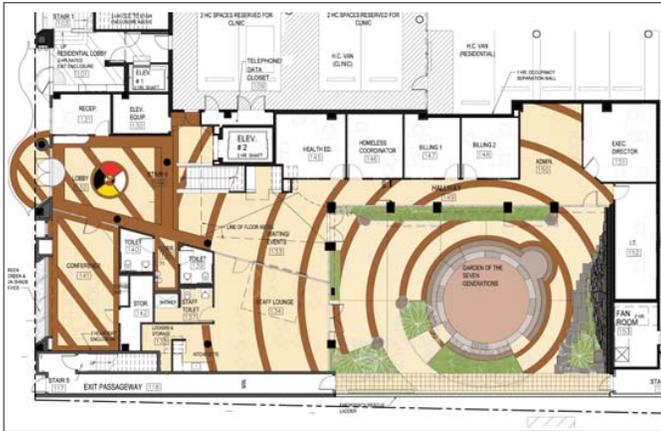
First Floor Plan. Image courtesy of Pyatok Architects.
